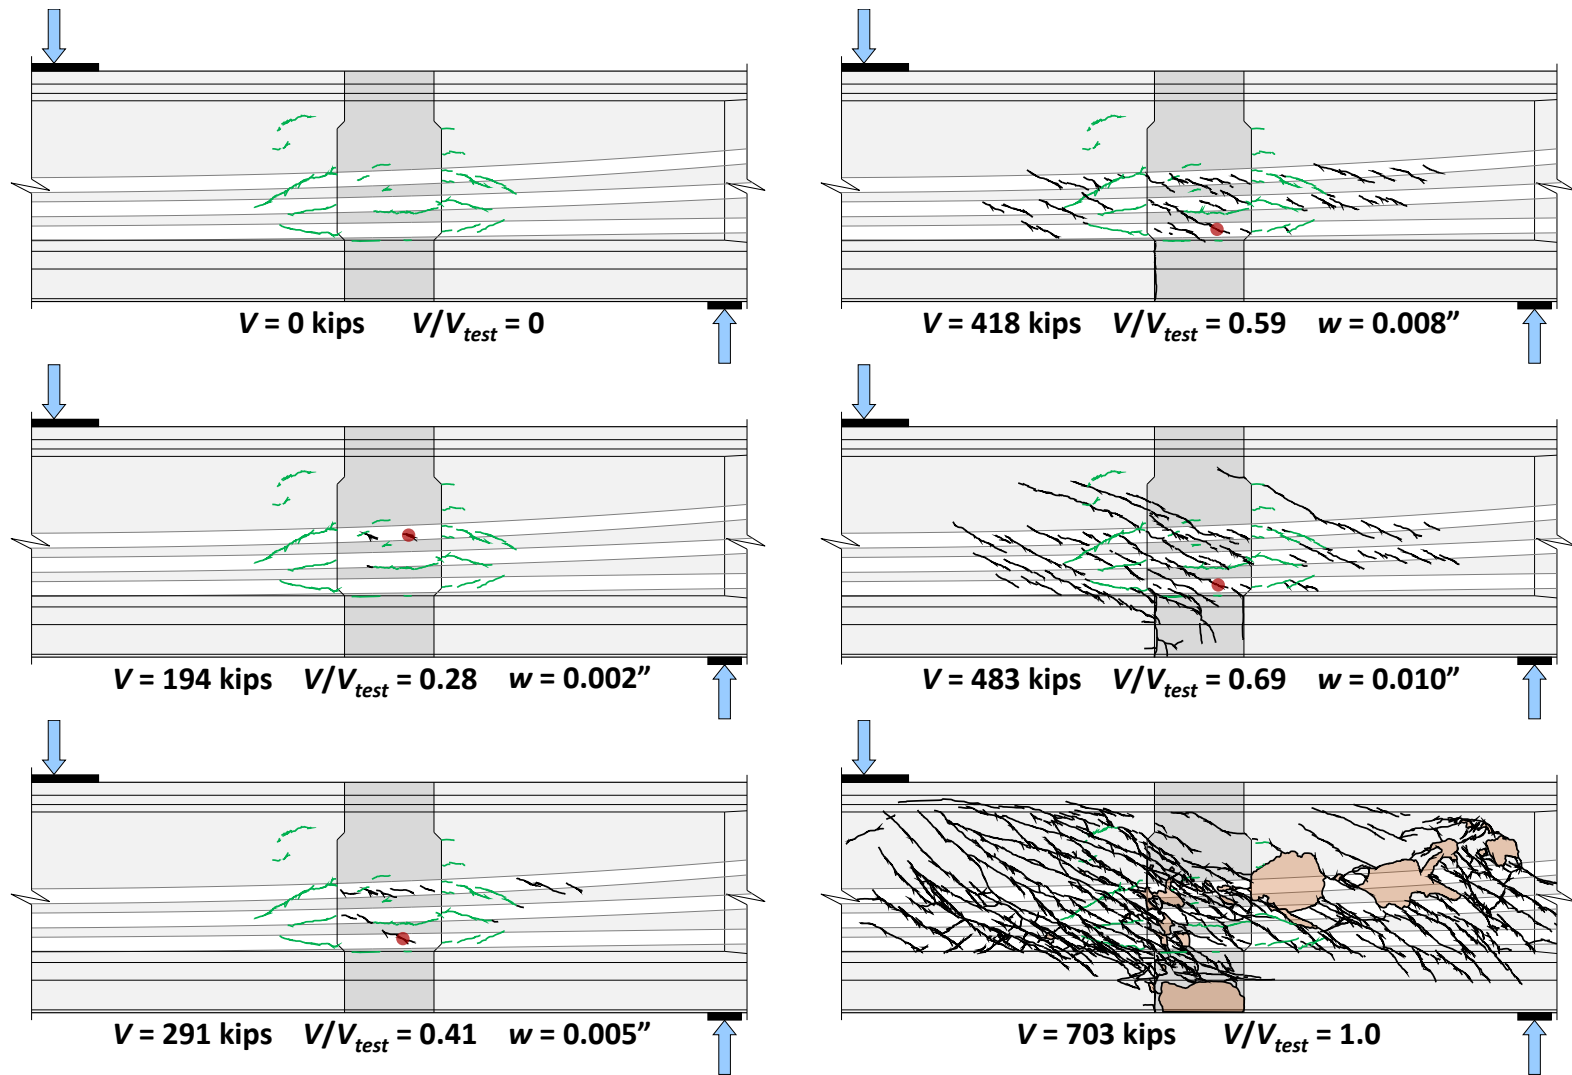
Summary of cracking behavior - Test Girder 2
